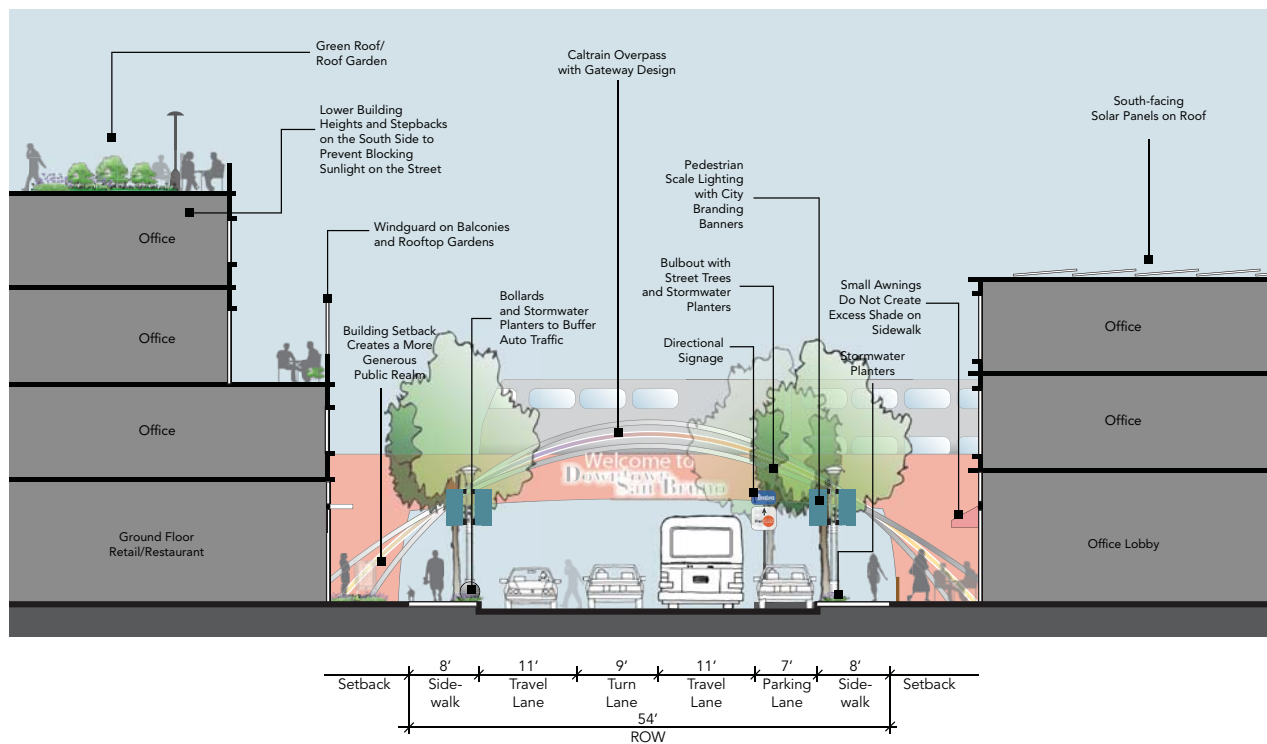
Proposed Improvements (San Bruno Avenue facing west between San Mateo Avenue and US 101)
